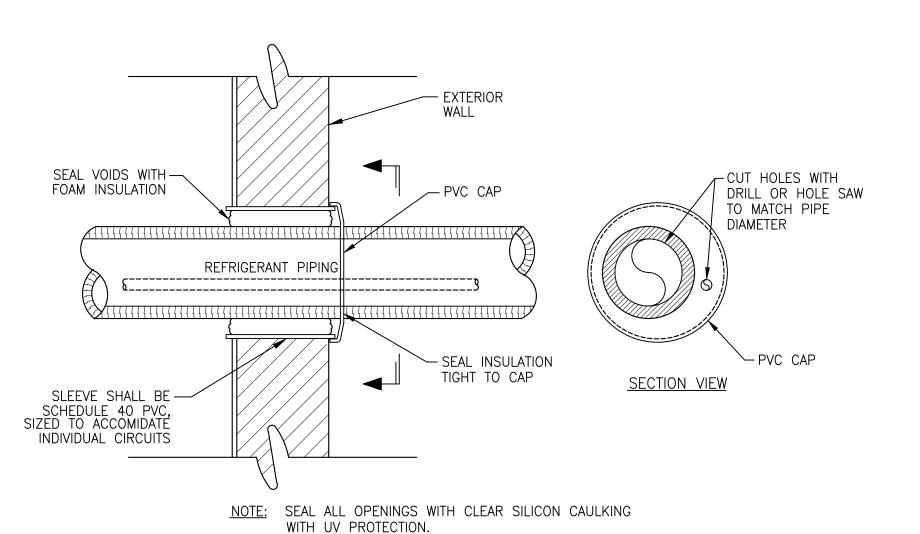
OUTDOOR HVAC UNIT INSTALLATION SCALE: NTS
